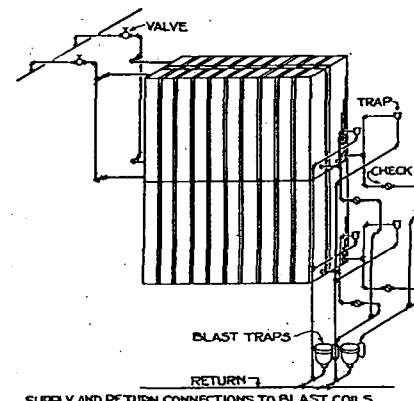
CONNECTIONS FOR BLAST HEATERS
